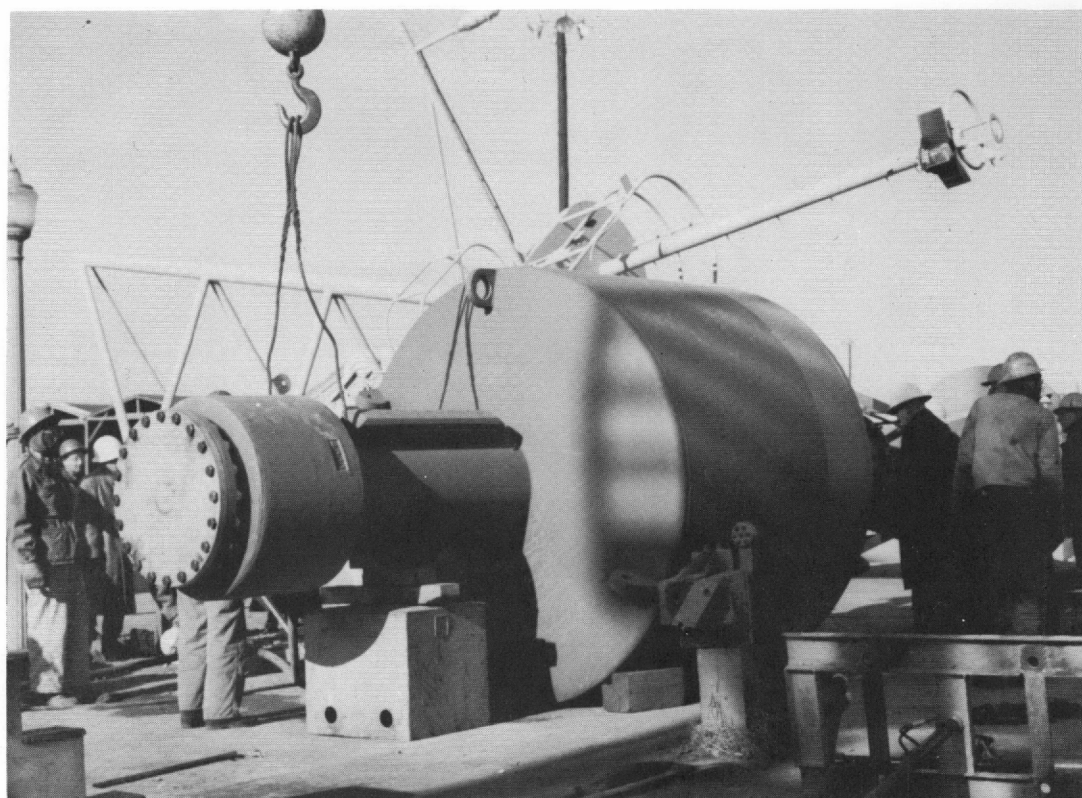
Generator Is Installed and Bolted into Position at the Base of the Counterweight Tube
